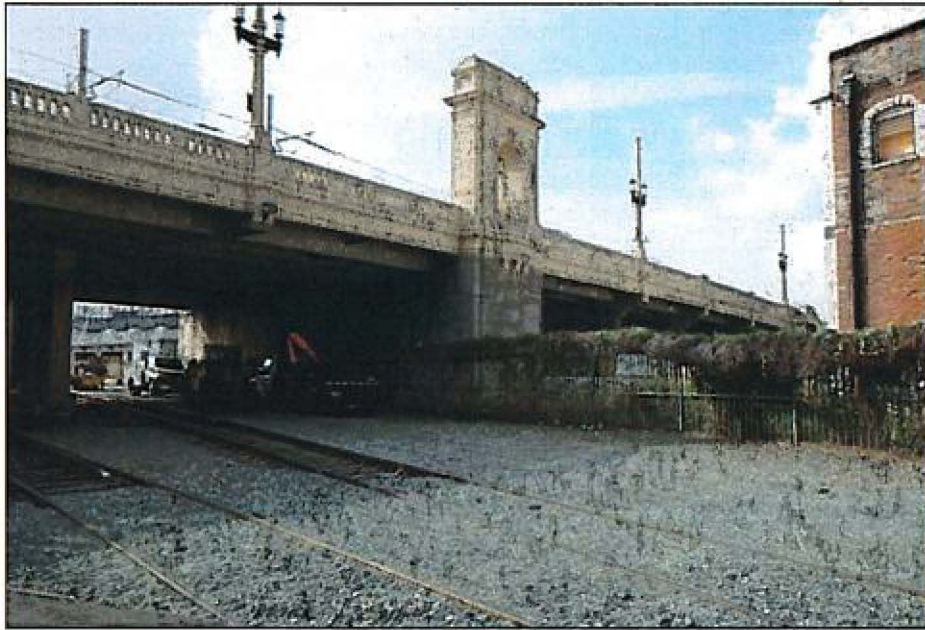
Widened north side of First Street Bridge over Metro track, view facing southwest, December 6, 2016, IMG\_4534.
